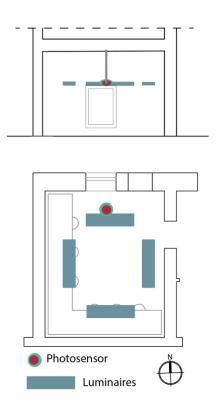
Section and plan of the laboratory with sensors and luminaires' location.
